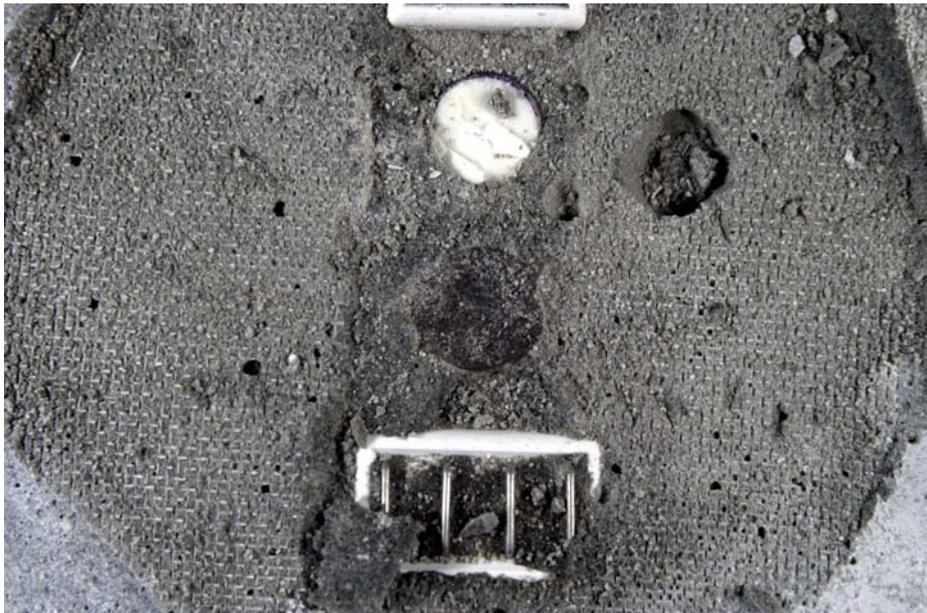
Top view of test sample after the ponding cup and upper half of the test mold have been removed. Some corrosion products were visible on the working electrode surface.
